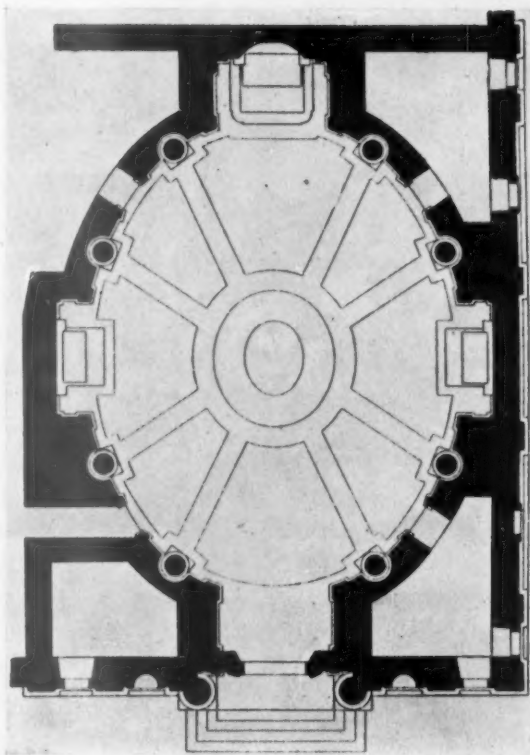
Ground Plan of S. Anna dei Palafrenieri, by Vignola
